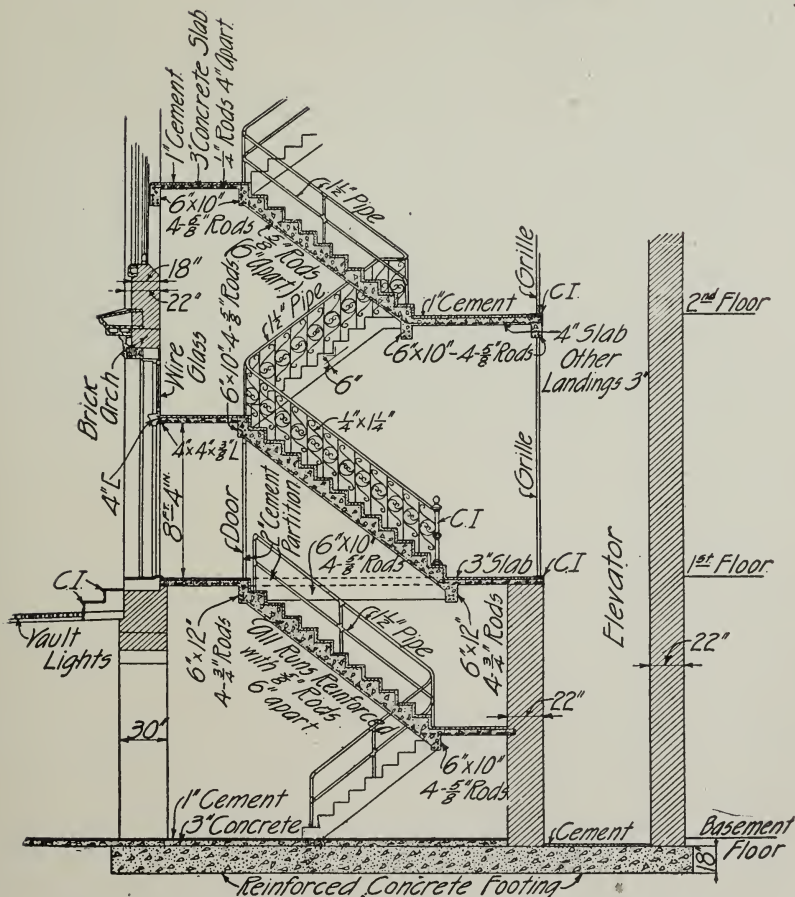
Reinforced Concrete Stairs. Ketterlinus Building, Philadelphia.
